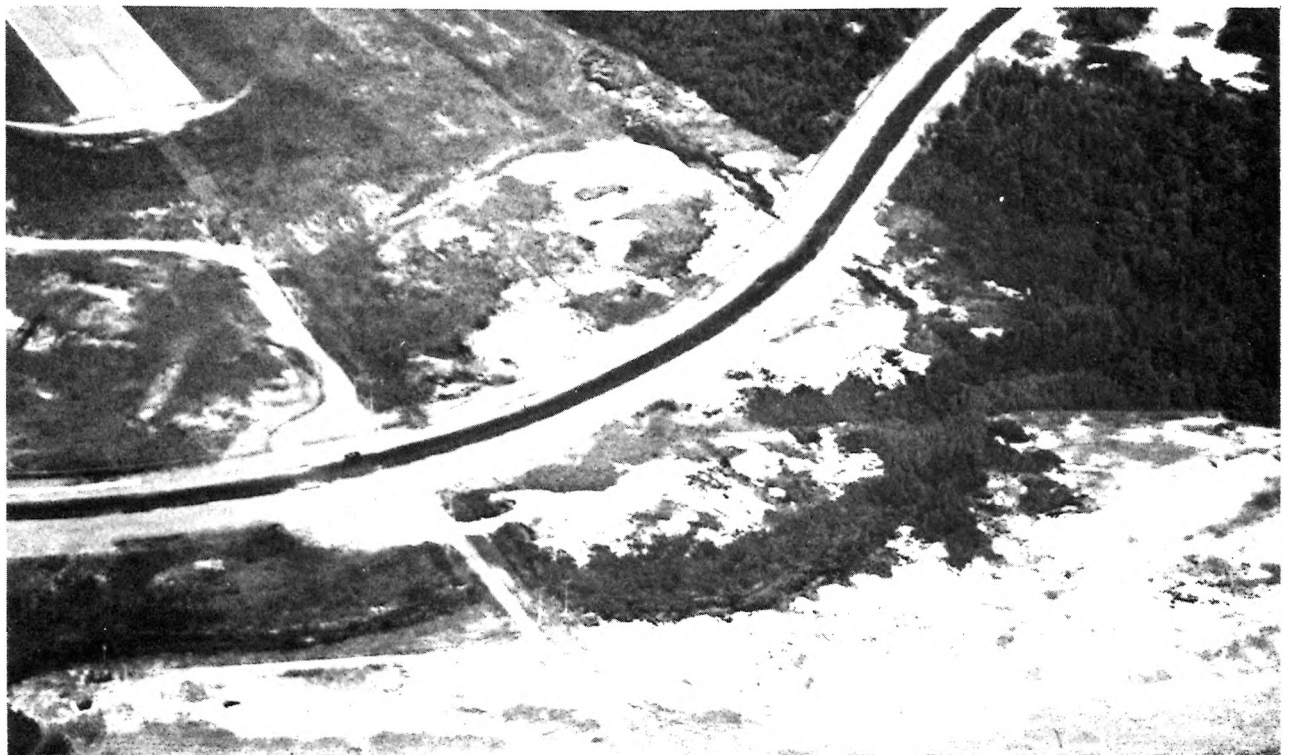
The Michaud site vicinity following road construction, August, 1986.
